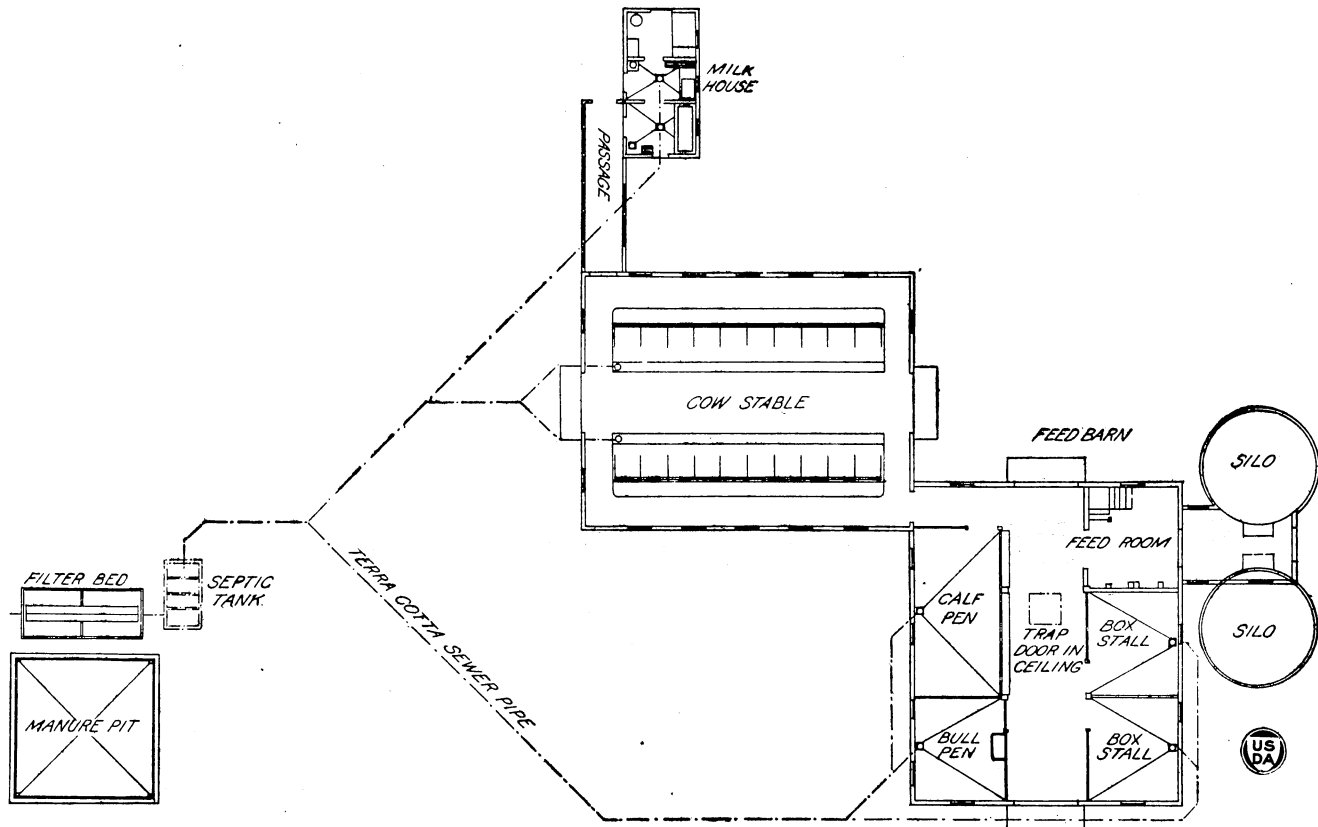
General arrangement of one-story stable, silos, milk house, and drainage system.
